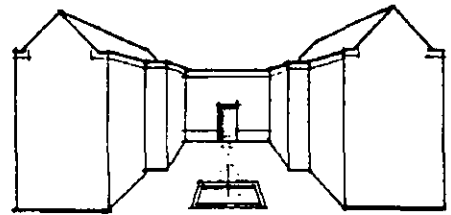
Architectural Concepts Design Criteria (b)(i), Building Orientation.
